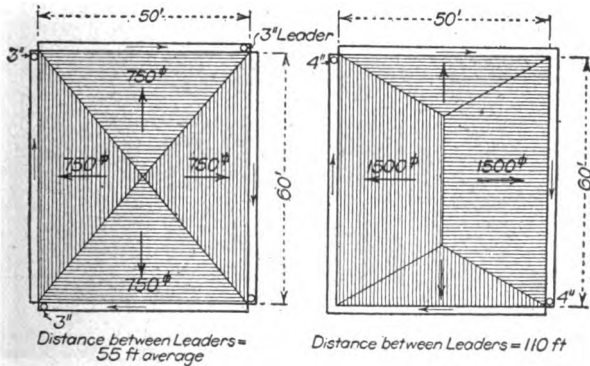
B.—Proportioning Gutters for Roof Drainage
